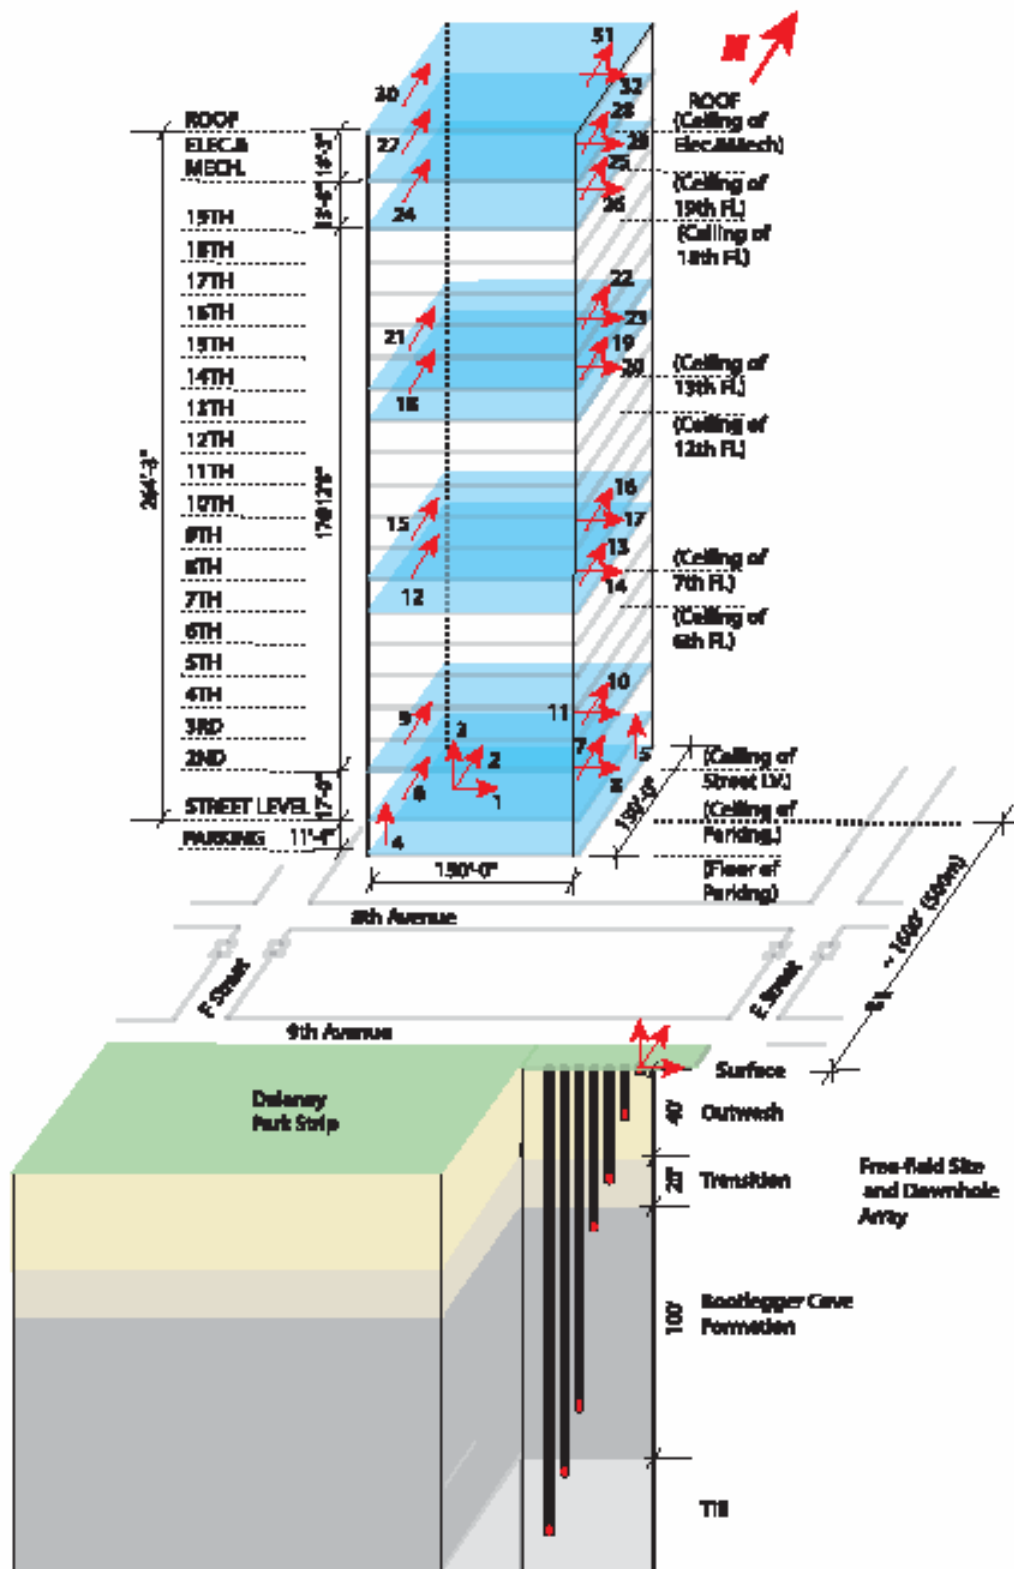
ANSS Structural Response Monitoring Plan for the Atwood Building in Anchorage
